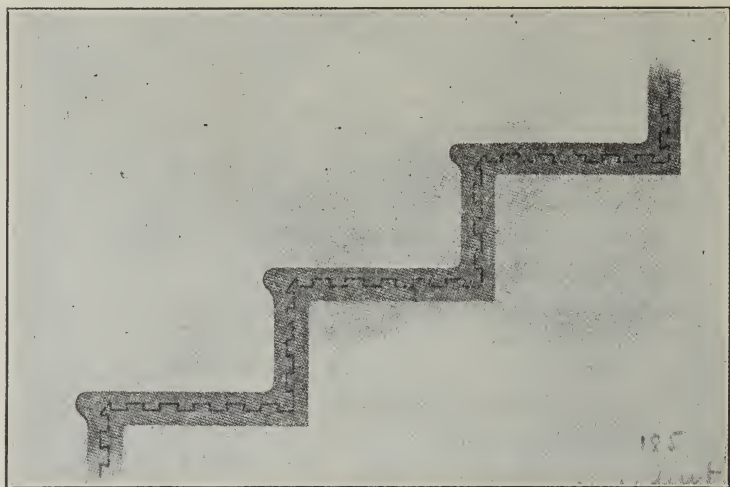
Reinforced Concrete Stairs. Ferroinclave.
